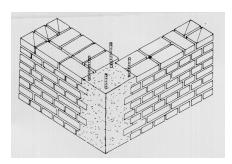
A: Seismic Strengthening: Tying the wooden beam to the concrete
